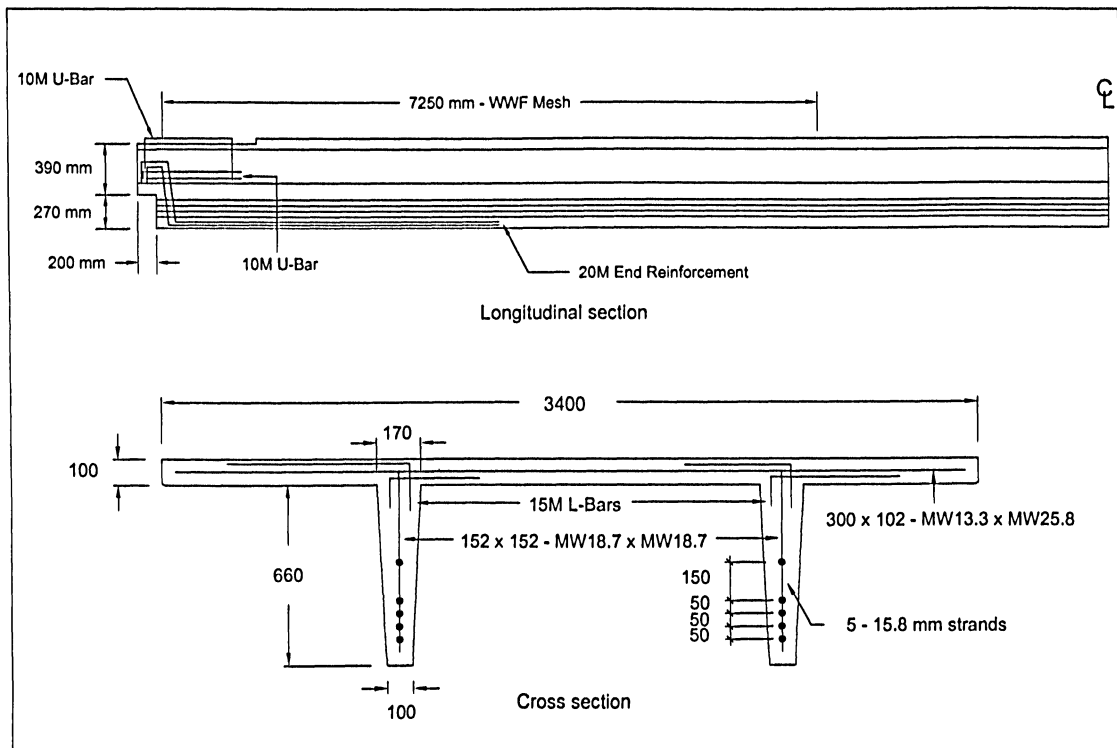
DT-102A girder reinforcement details (Cofini, 2005)
